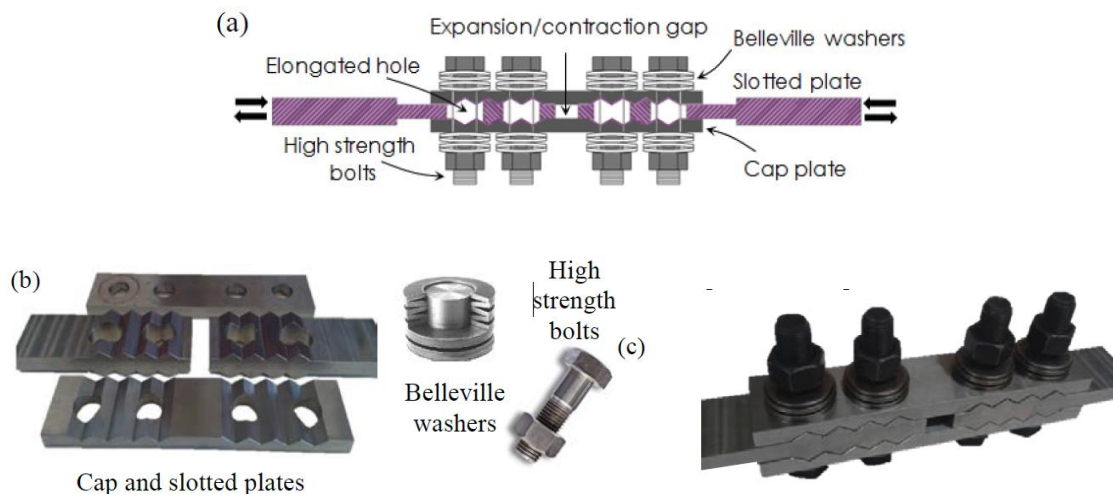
RSF joint: a) Section view, b) Components, c) Assemblage
